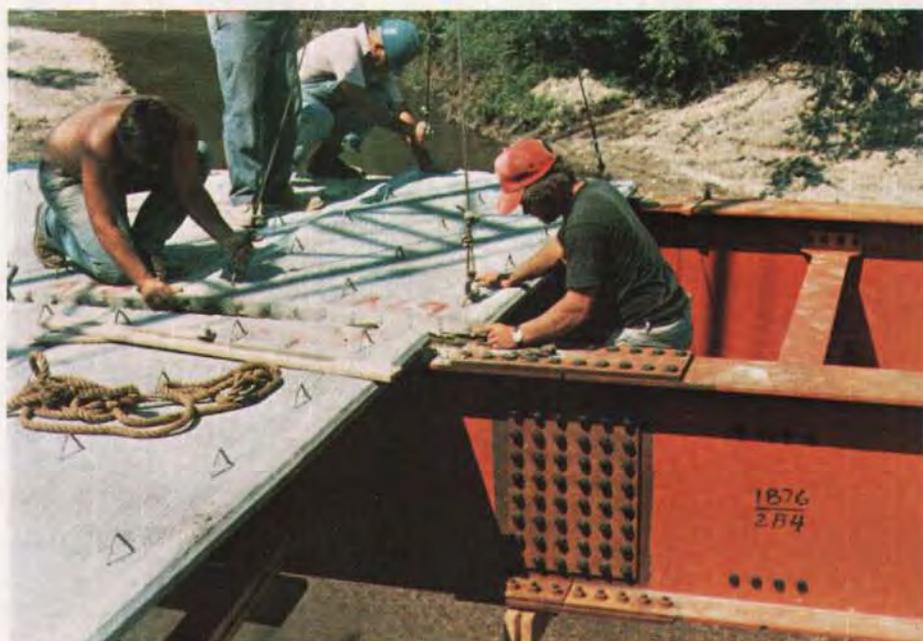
Placing panels at steel beam splice where fillets are small. Notice that small bolt head must be on top of flange plates. Common ironworker practice is to put bolt head on underside of top flange.
